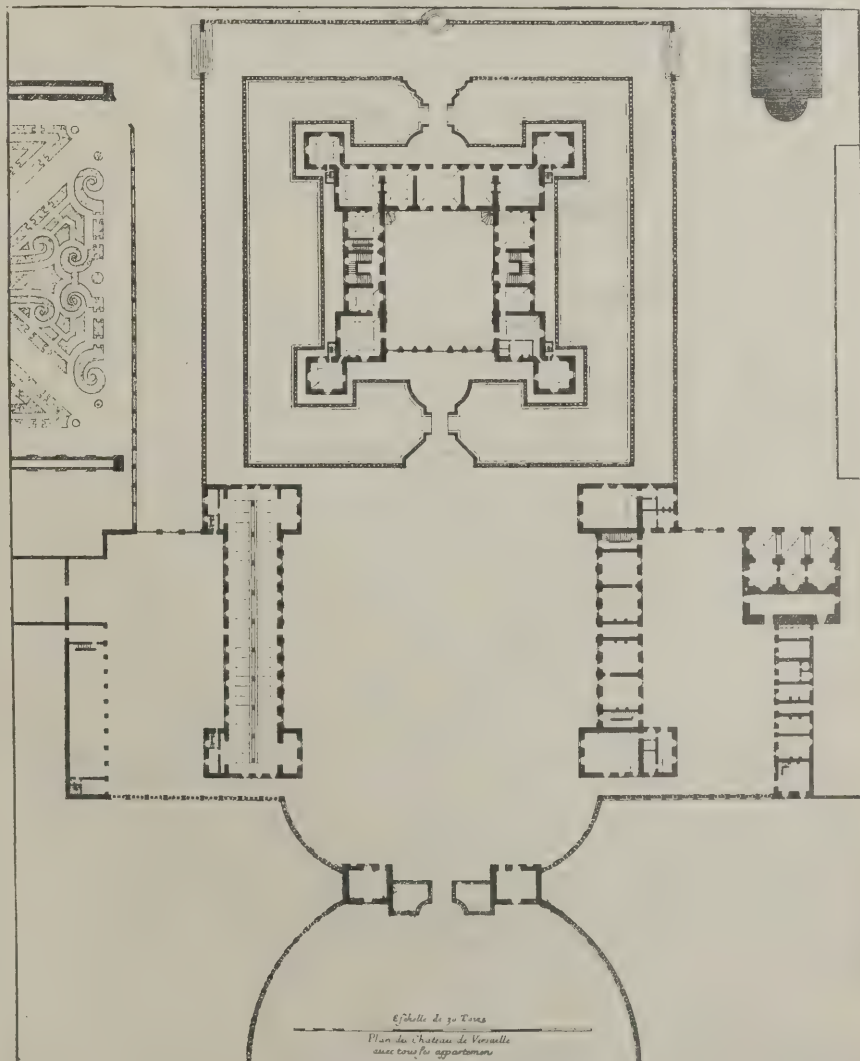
VERSAILLES: PLAN OF THE ORIGINAL CHATEAU, WITH ITS OUTBUILDINGS (1667).
